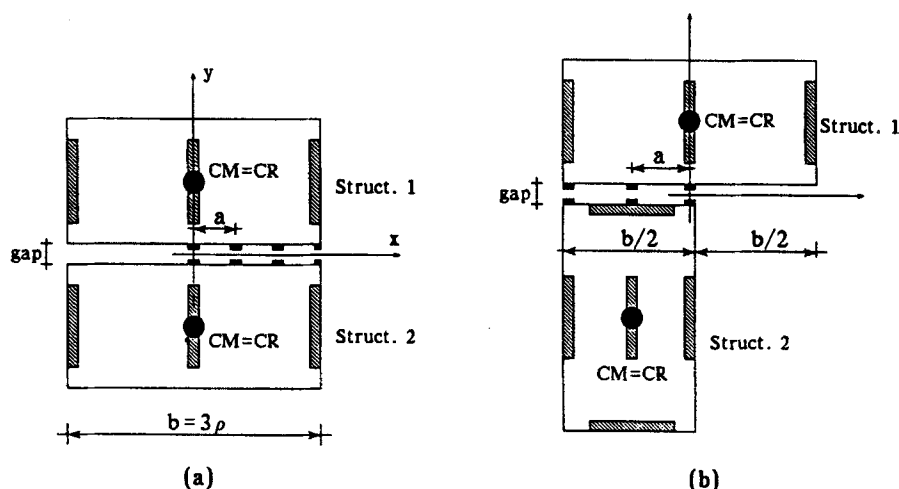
Model geometries: (a) Symmetrically aligned floor slabs. (b) Asymmetrically aligned floor slabs
